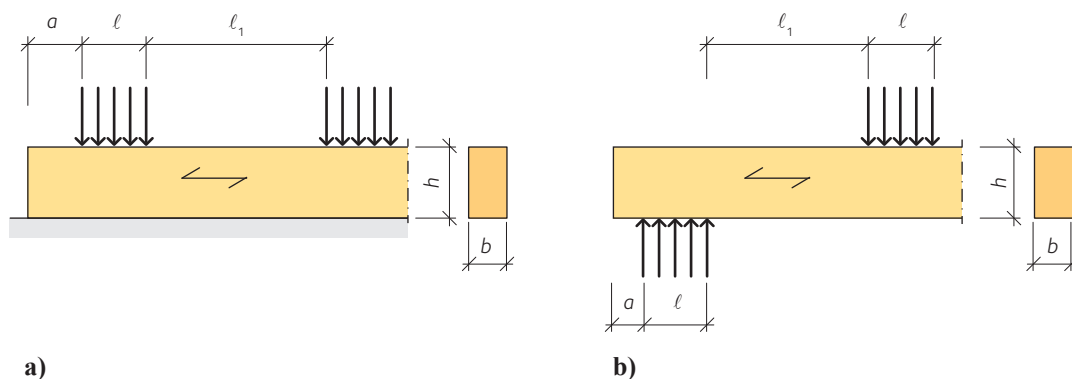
Member on a) continuous supports (for example a ground plate on a concrete slab) and b) discrete supports (for example a beam supported by columns).
